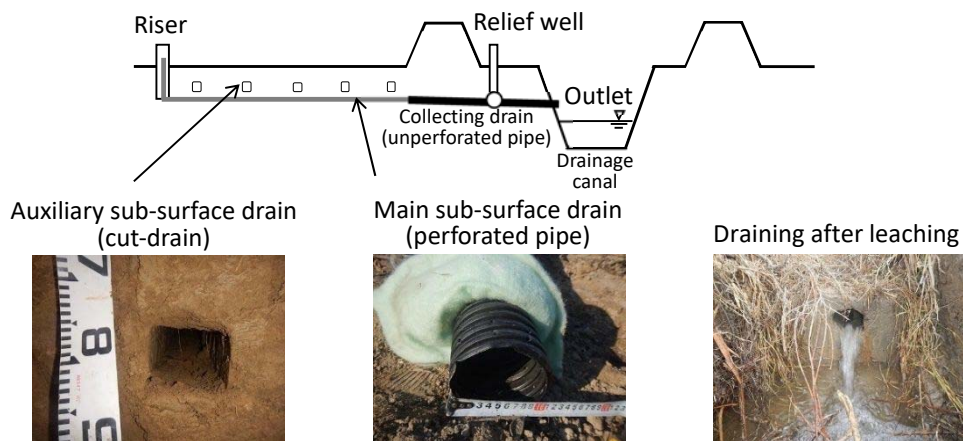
Structure of a shallow sub-surface drainage system
